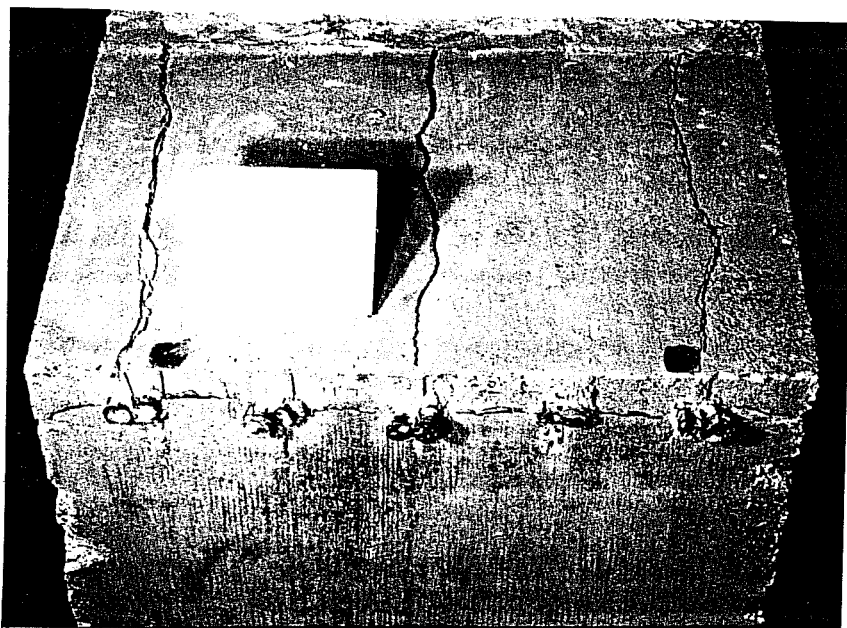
Failure mode for one layer of bundled bars with transverse reinforcement (Test 13 1-16-NS-B)
